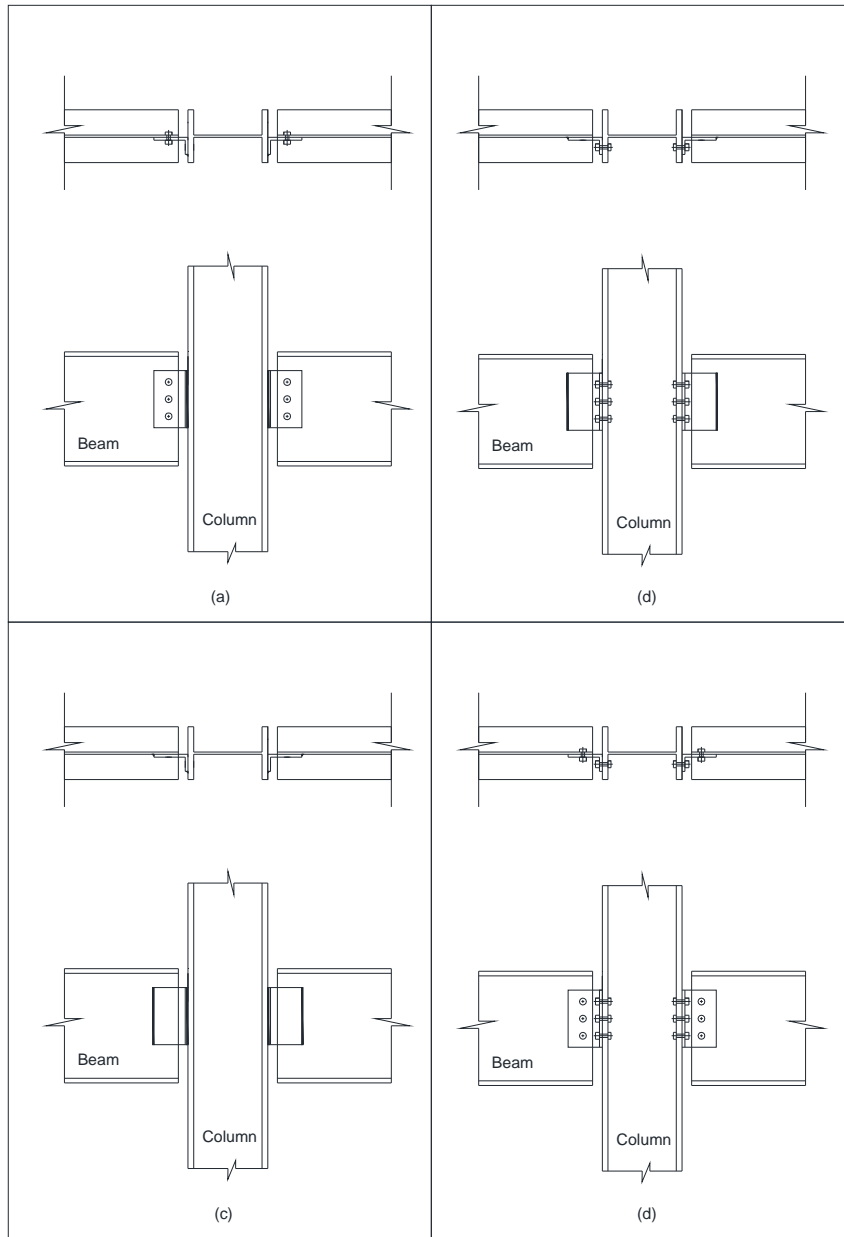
Types of SA shear connections: (a) welded-bolted (b) bolted-welded (c) welded-welded (d) bolted-bolted
